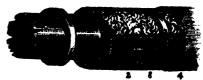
Mineral Wool within Wooden Collars, made in Sections and Protected next to the Pipes by Tin or Sheet Iron.
